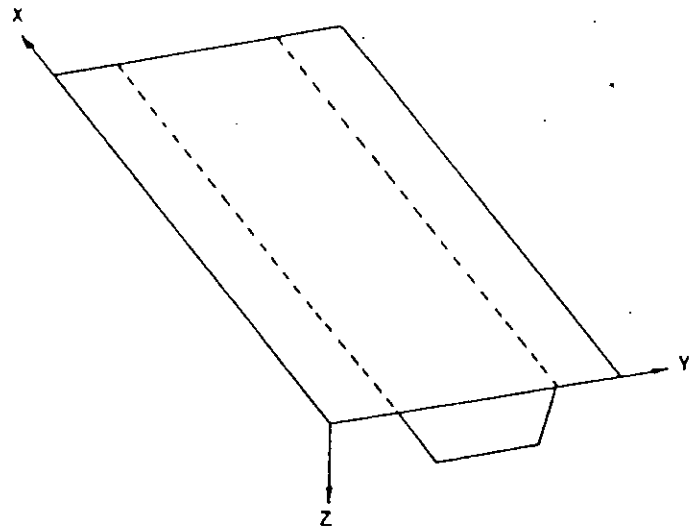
(b) A TYPICAL PRISMATIC BOX GIRDER
